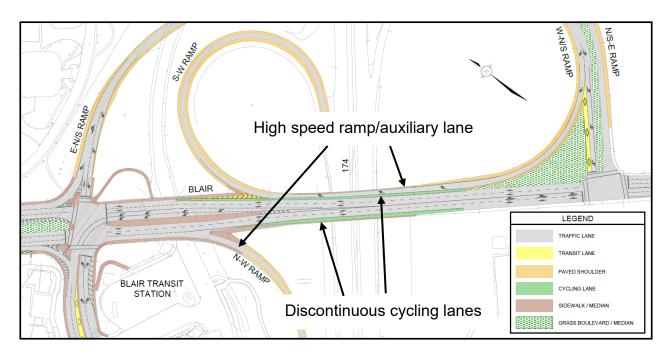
Existing Blair Road / OR174 Interchange Plan View
